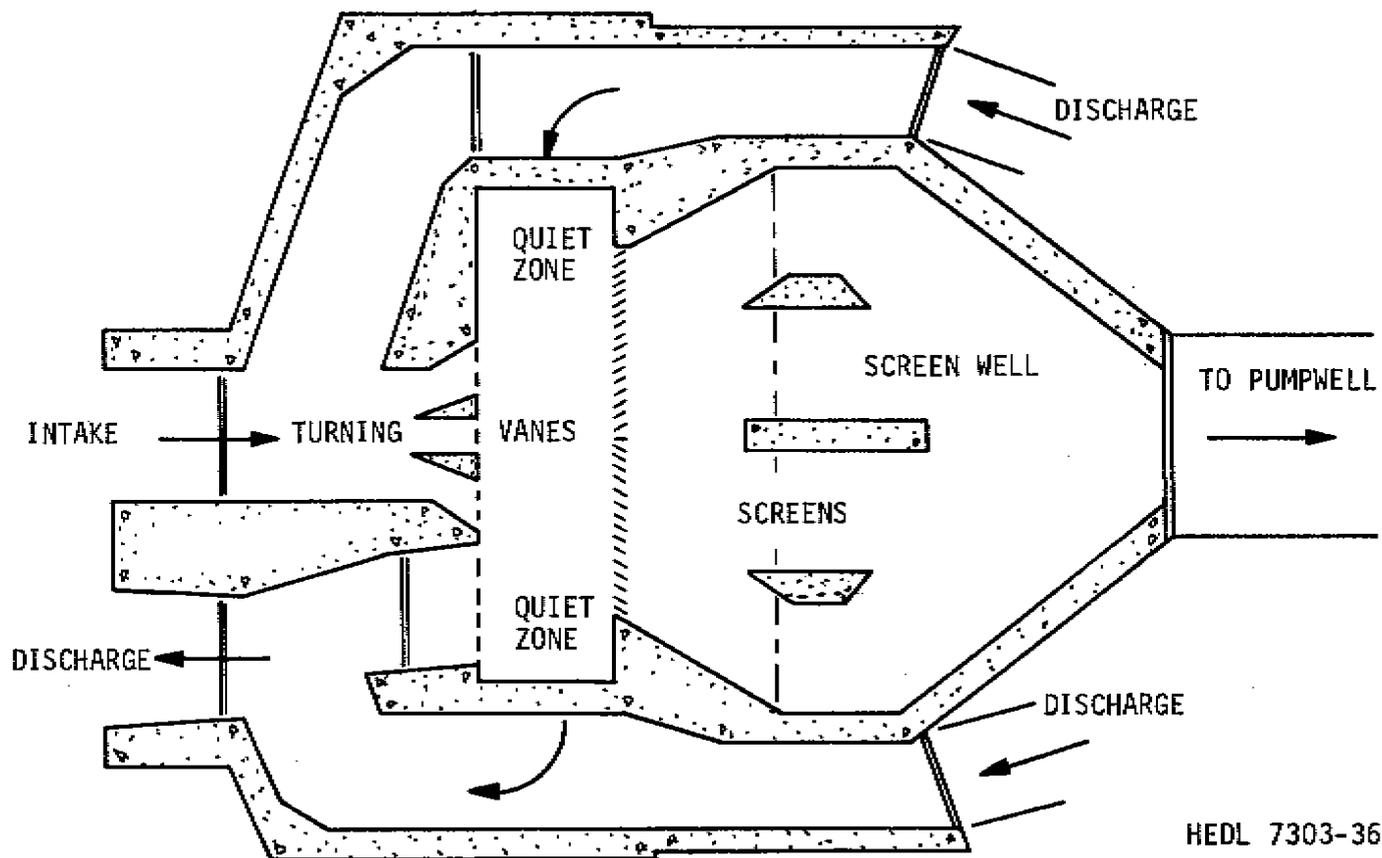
Plan View of Screenwell Used at Huntington Beach Steam Electric Plant.
